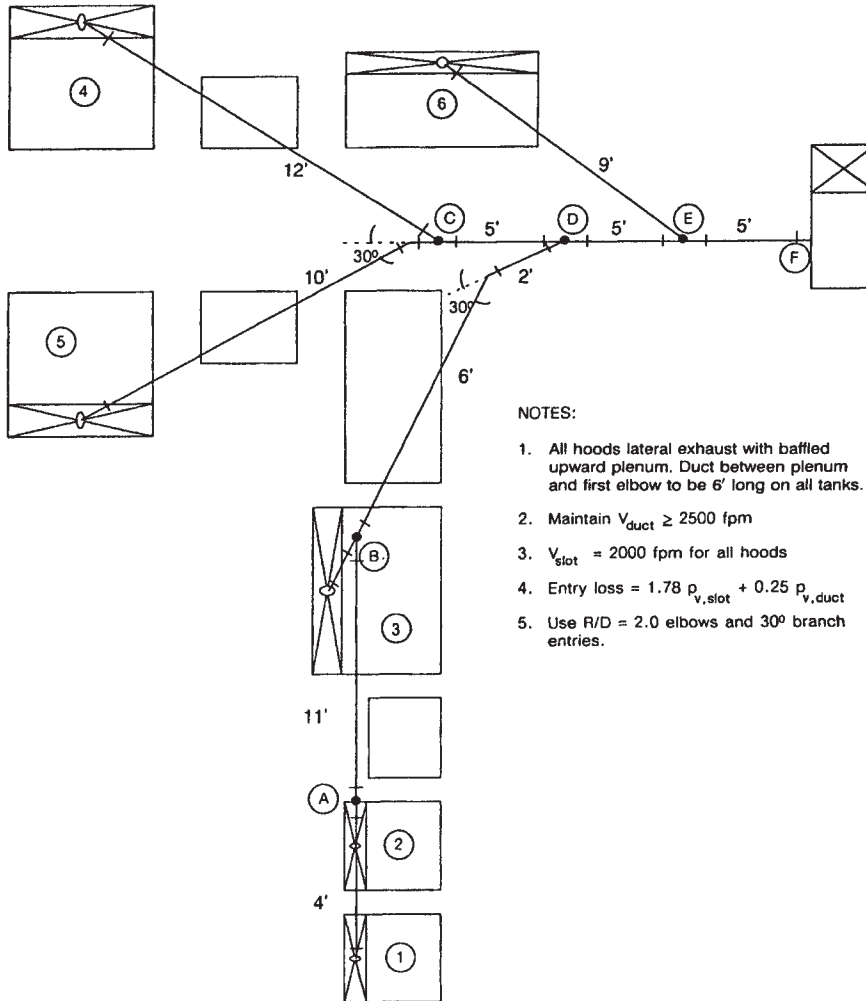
Layout of ductwork for local exhaust ventilation in the electroplating shop.
